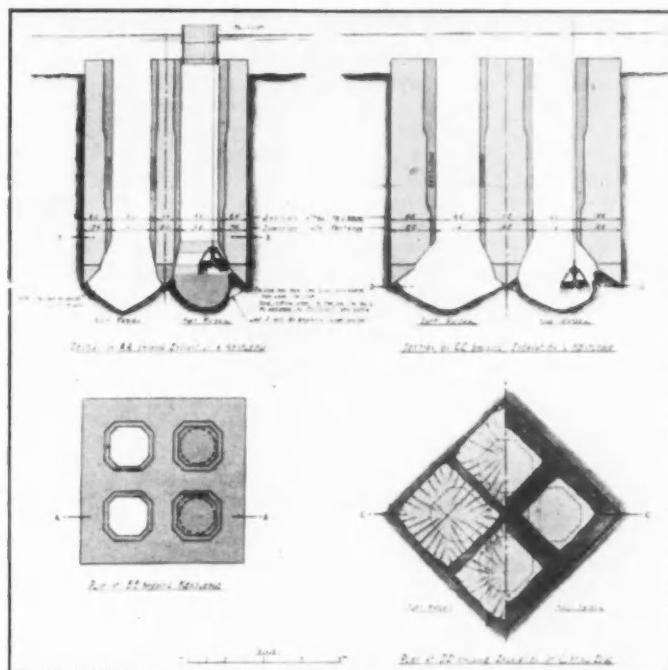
Sectional elevation and plan of monolith wells being excavated by means of grabs.
